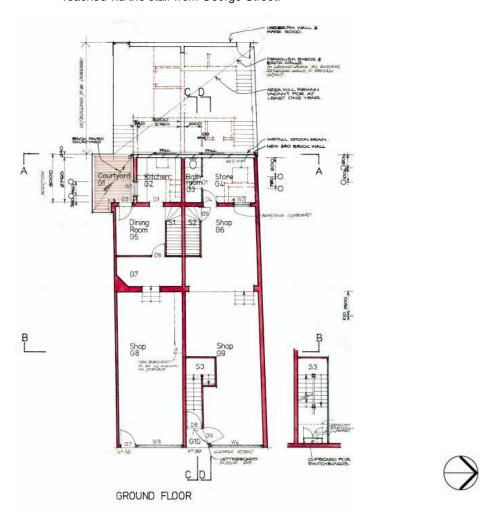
139–141 George Street, Proposed Renovations, Stage 1, January 1978, Ground Floor Source: PMNSW Drawing No. HP-9-1.
